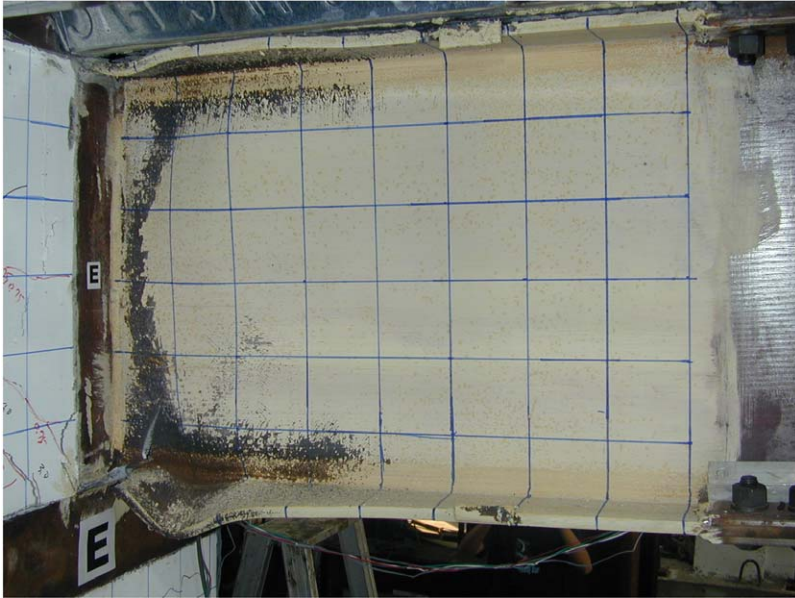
A photograph showing the fracture of the beam flange for specimen INUCS after the test.
